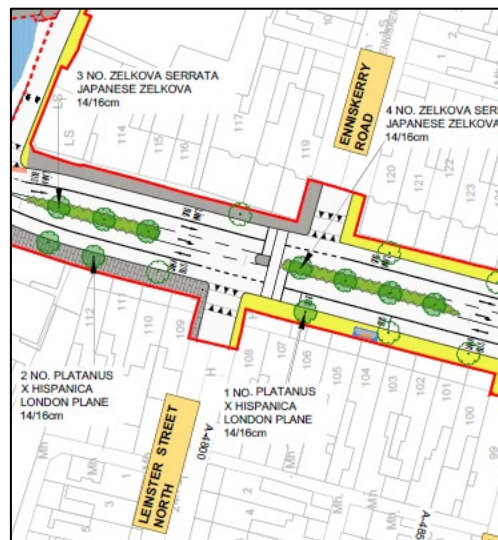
Proposed Scheme Landscape Plan Sheet 13 at Phibsborough Road
